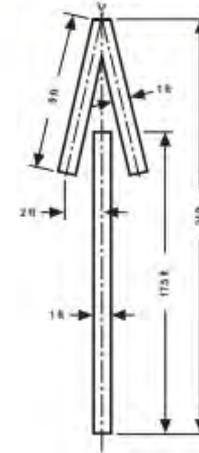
B-24 (CA). Examples of Standard Arrows for Pavement Markings (Sheet 2 of 8)
